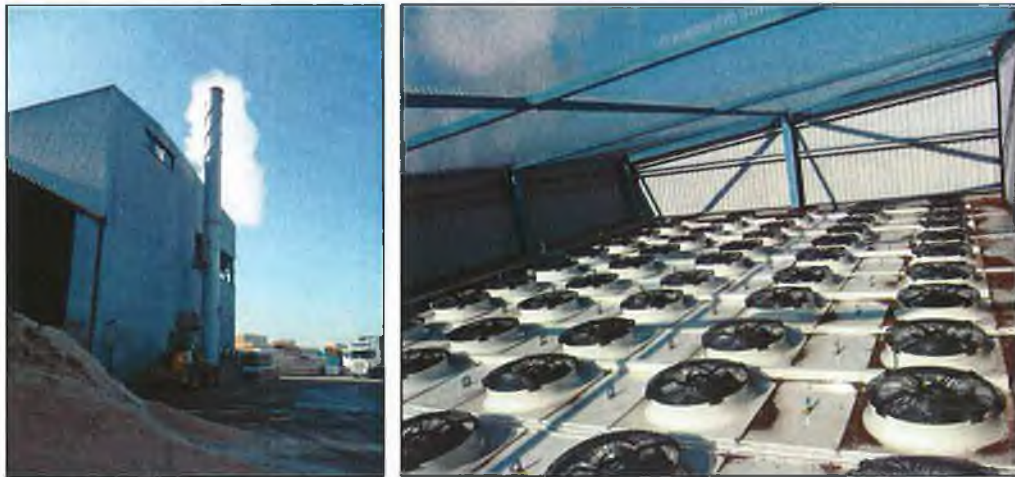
Boiler Flue Stack [Left] and Steam Exhaust Condensers [Right]
